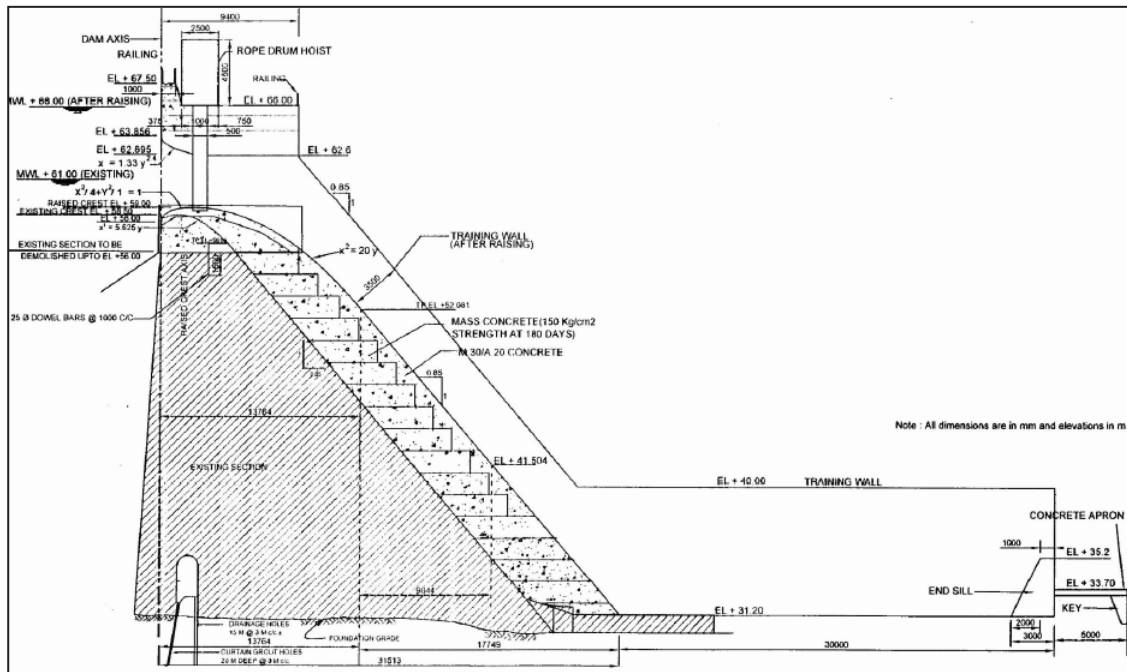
Original and modified cross sections of Dhanikhari dam spillway
